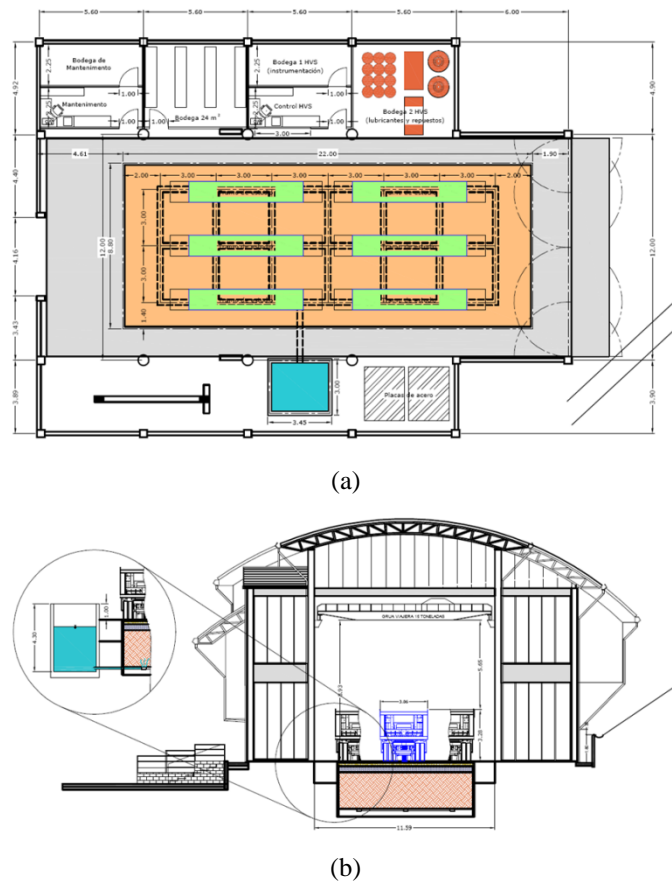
(a) Plan view and (b) lateral view of PaveLab building with HVS equipment
